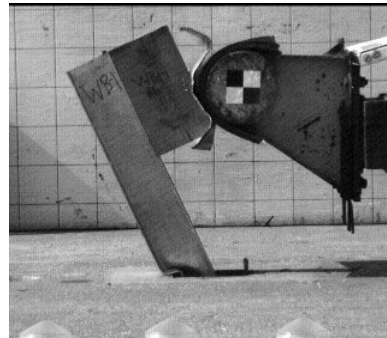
Wooden Spacer Block Impact Location, Test WB-1
